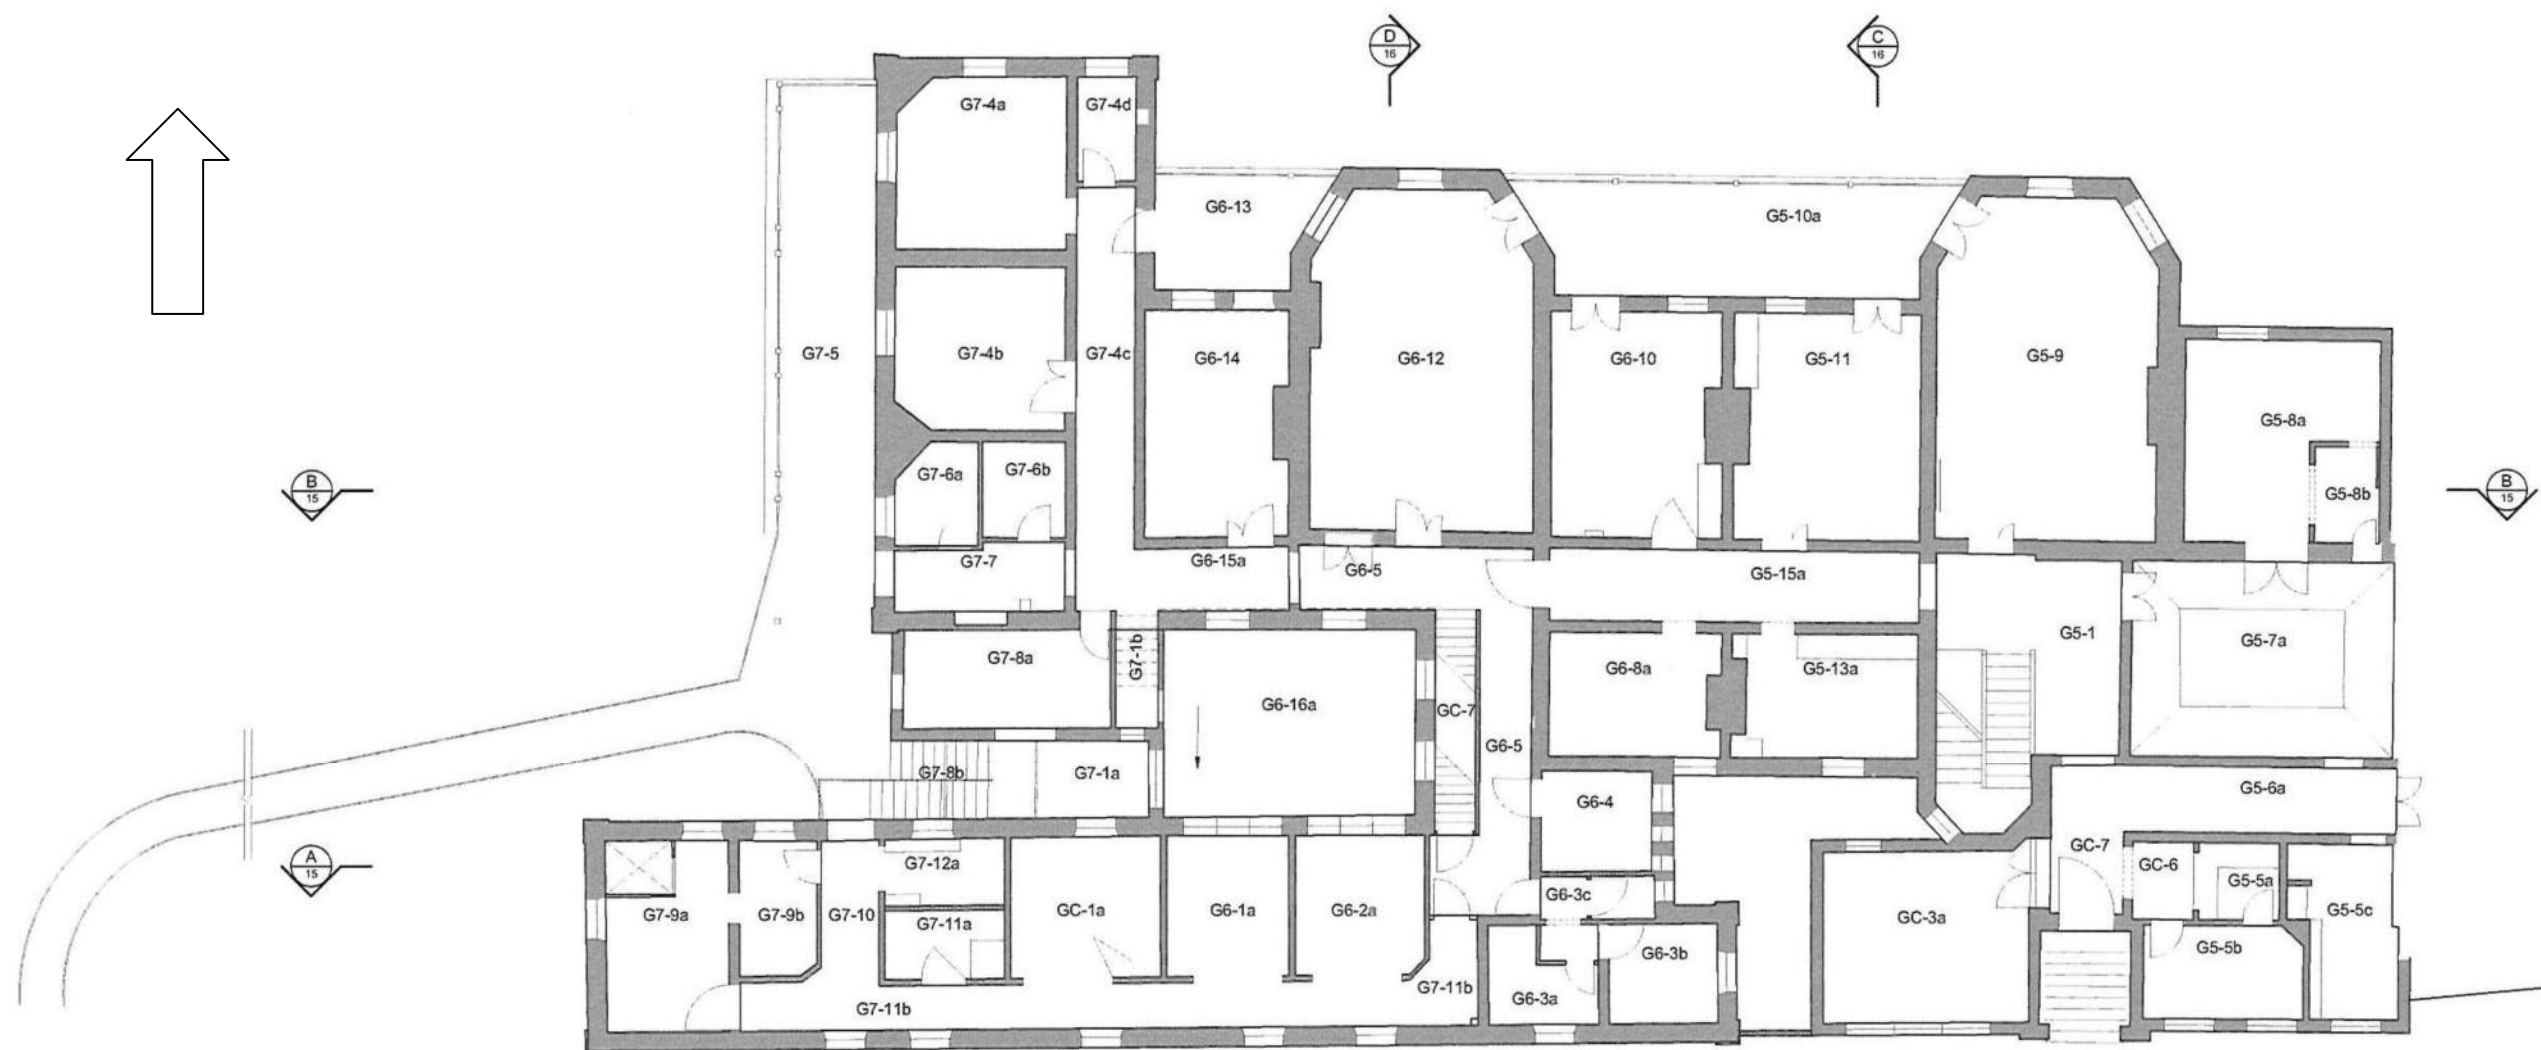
Plan showing the Ground floor level layout and space numbers used throughout this report.
